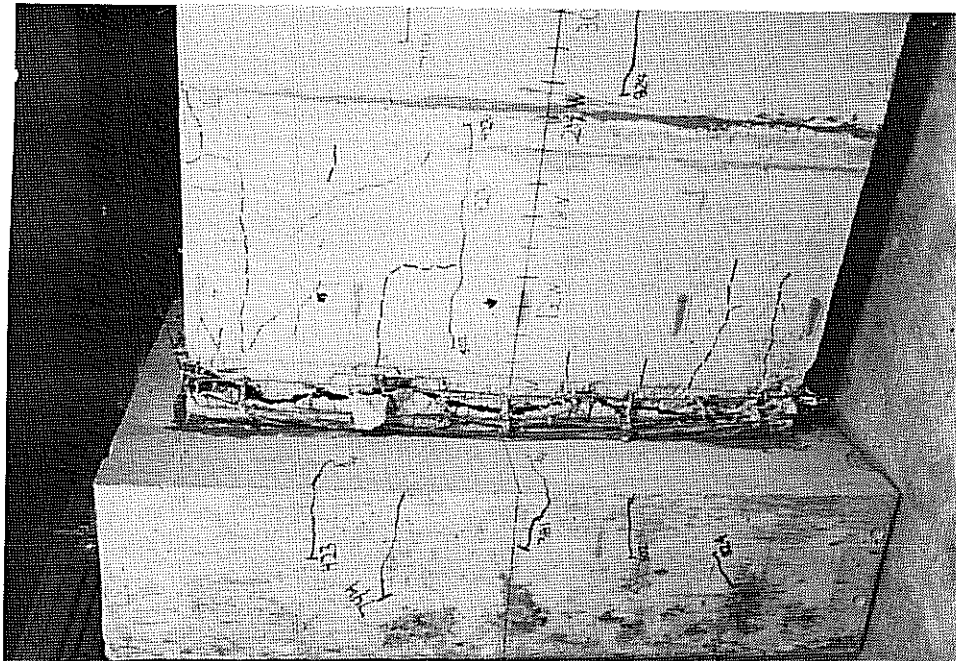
Specimen 7S22 Compression Flange Close-Up
